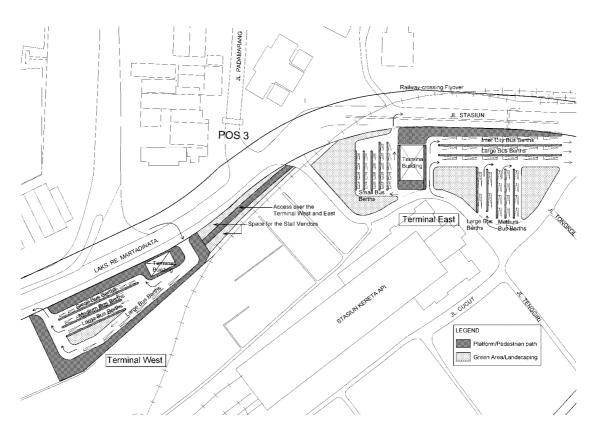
B-11 Proposed Layout Plan for the Alternative-2
